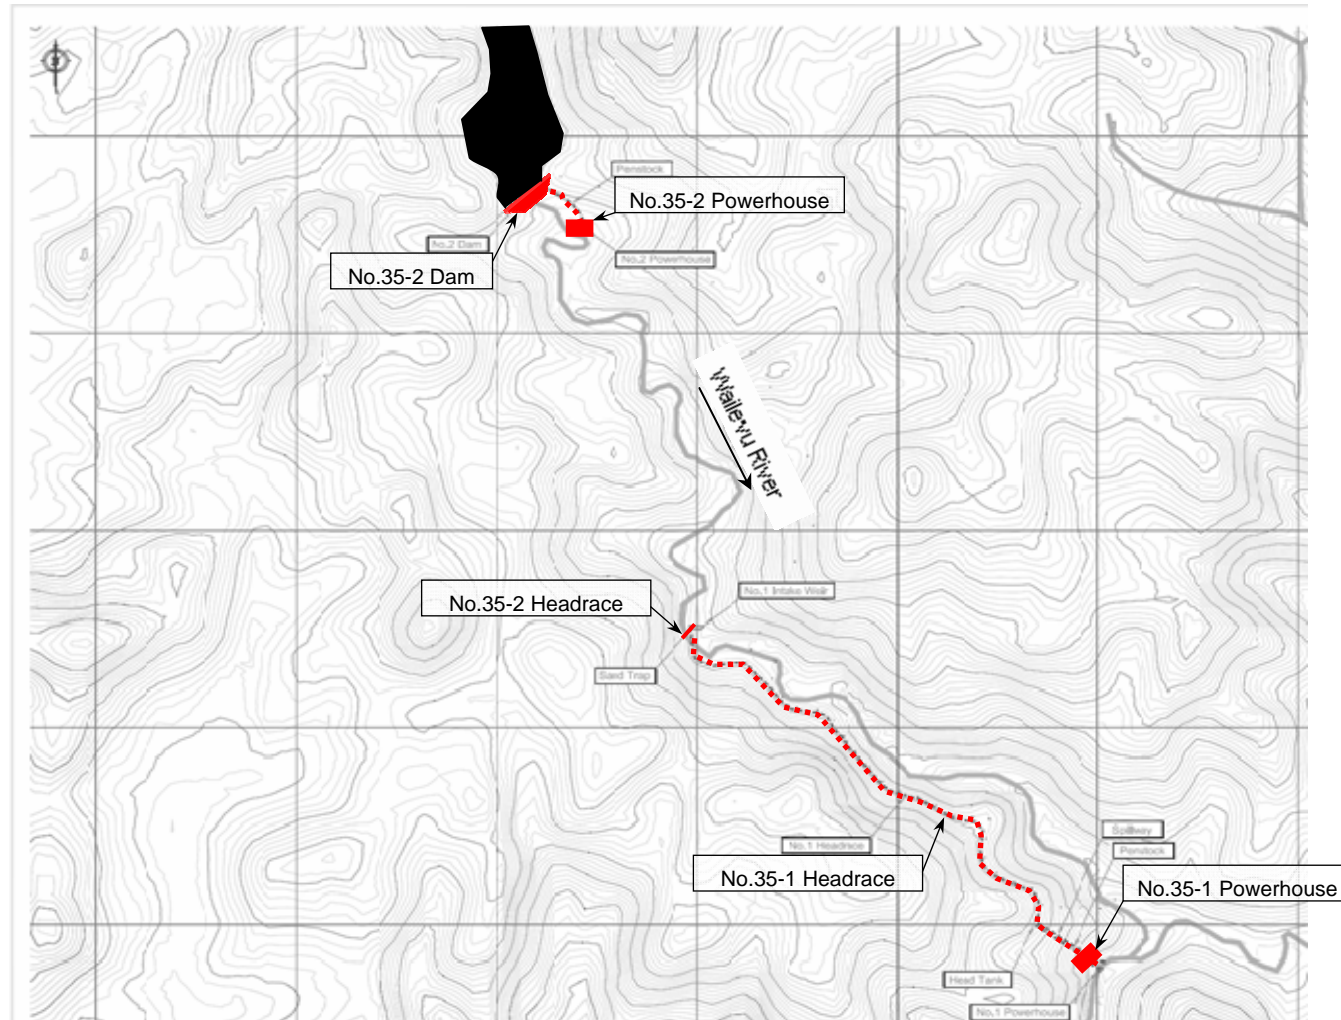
General Layout Plan for the No.35 Wailevu Hydropower Scheme
